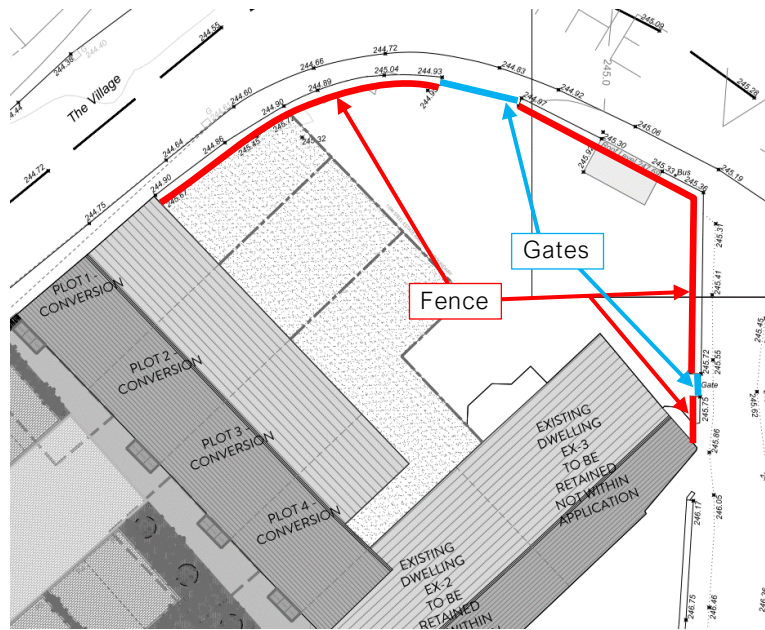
Proposed Garden Fencing Plots No. 1 to 4
